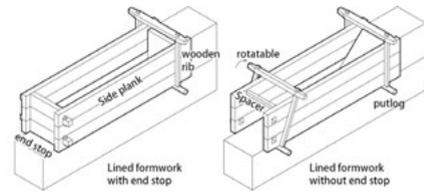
Two kinds of lined formworks fixed with putlogs and wooden ribs (author)
